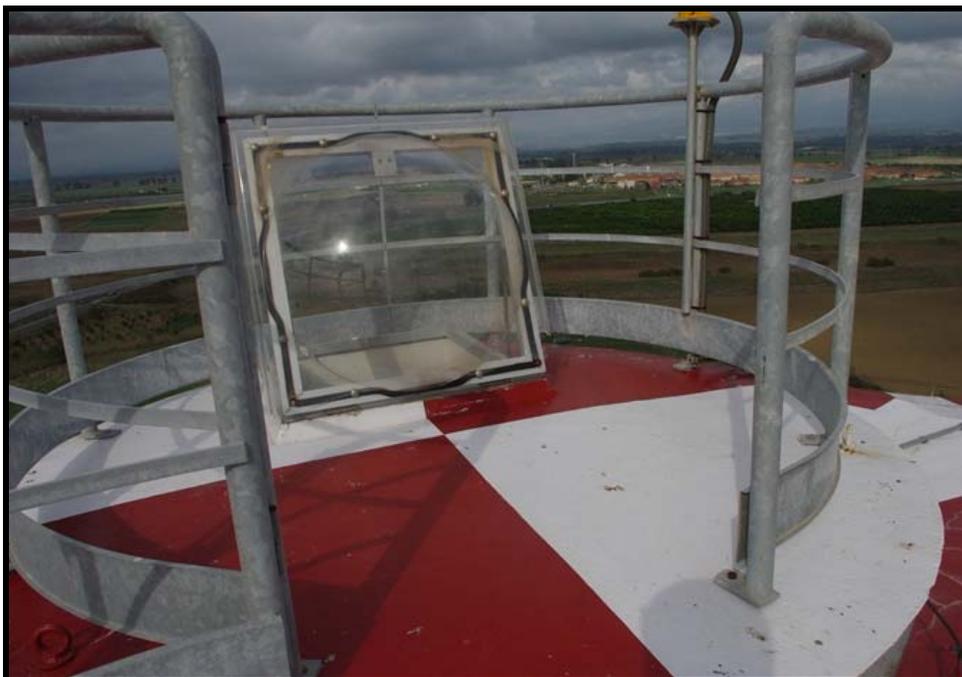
Safety railing and roof manhole on access tube projection.
